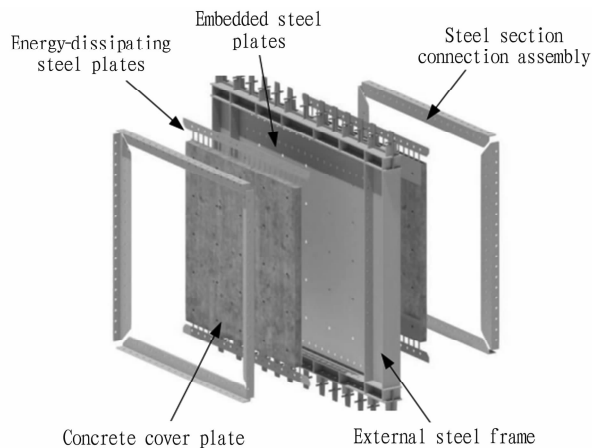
New prefabricated energy-dissipating steel plate wall component
